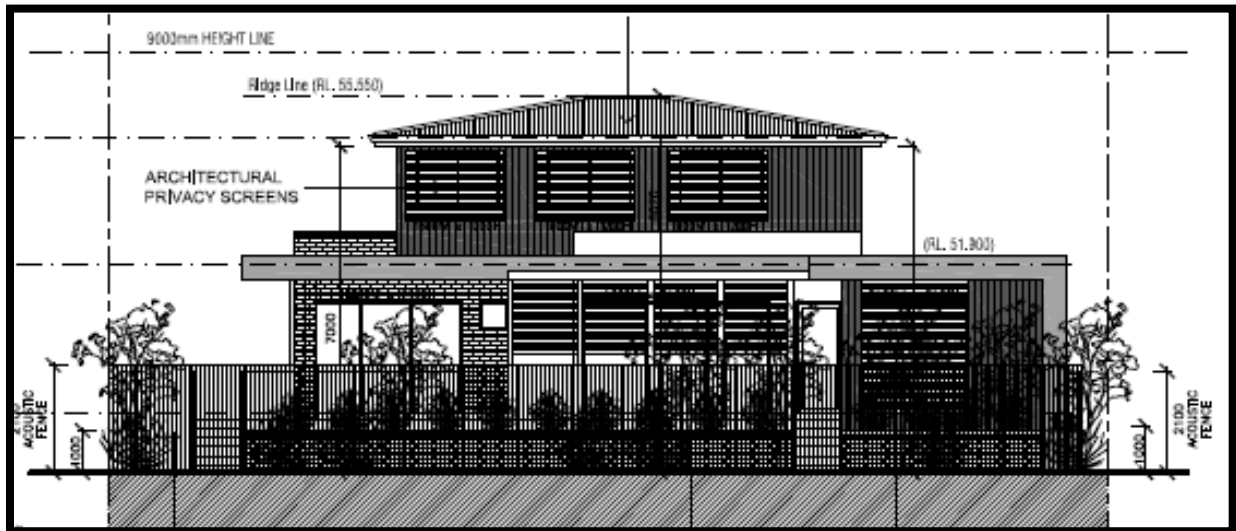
South west (rear) Elevation at 49 Jersey Avenue Mortdale (Source – NDGroup Architects)
